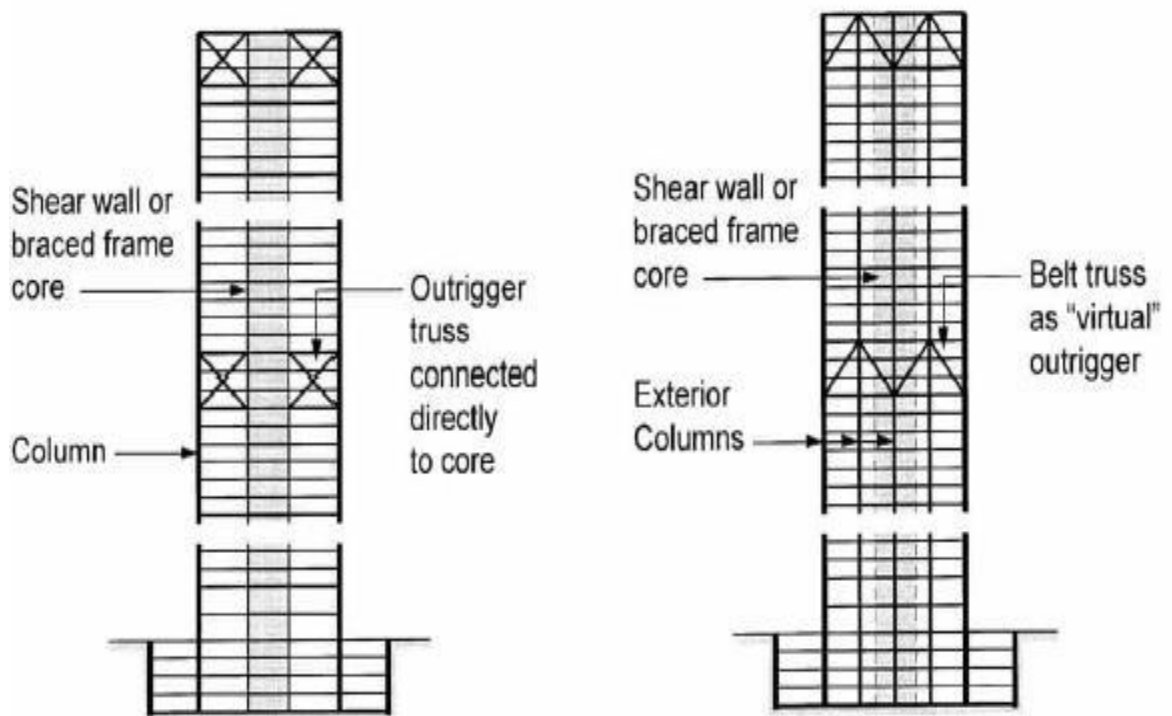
Conventional outriggers (left) and virtual outriggers (right).
